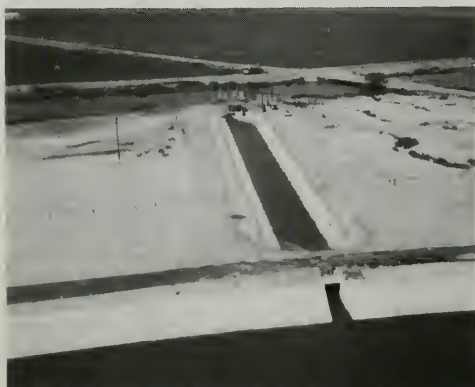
Buena Vista Turnout (Buena Vista Outlet Canal in Background)
